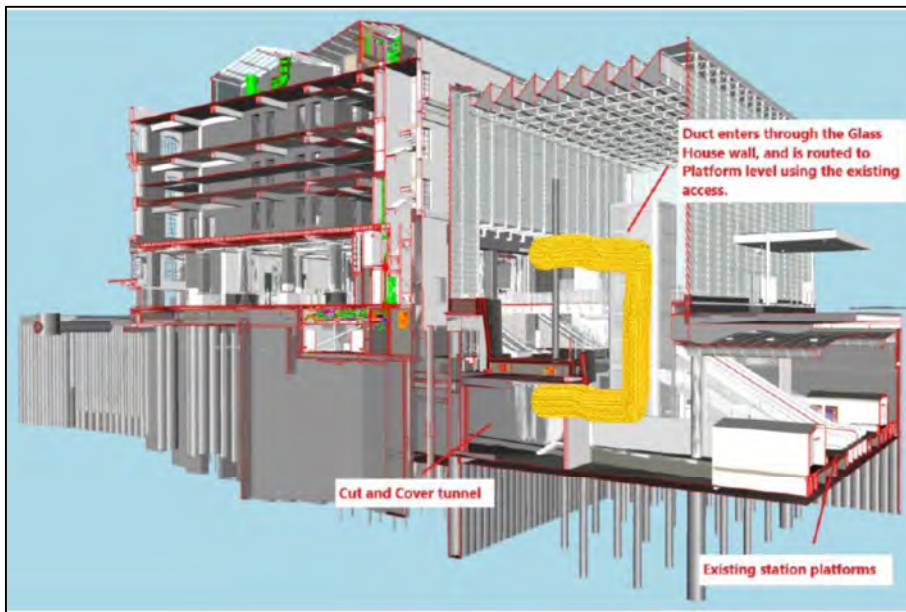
Ventilation ducting extending down into the tunnels on Galway Street side
